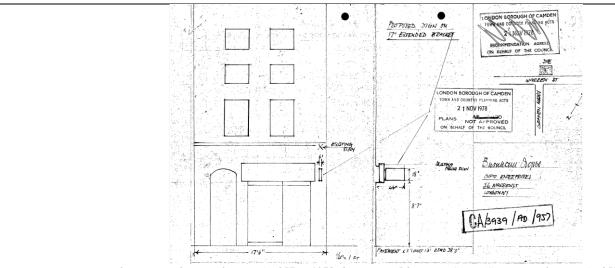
Drawings from application AD957 in 1978 showing No.56 Warren Street (Source: application AD957)
